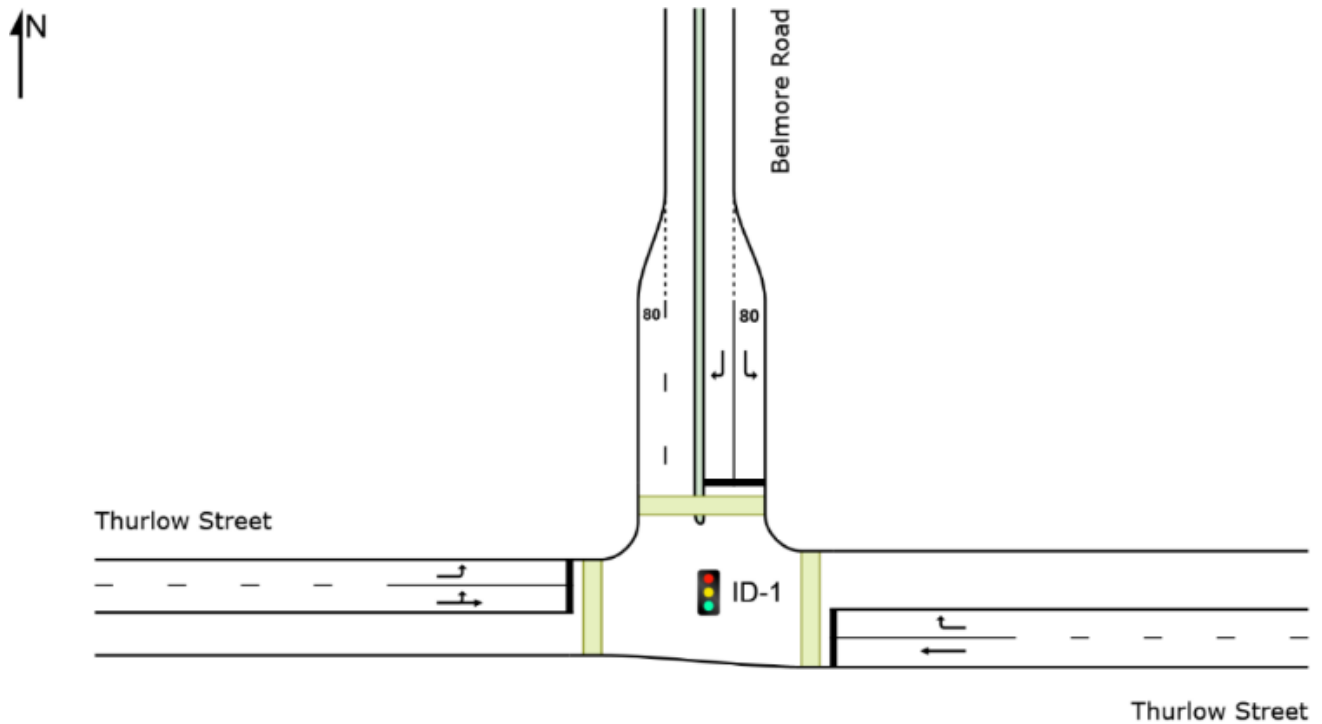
Belmore Road/Thurlow Street proposed layout improvements
